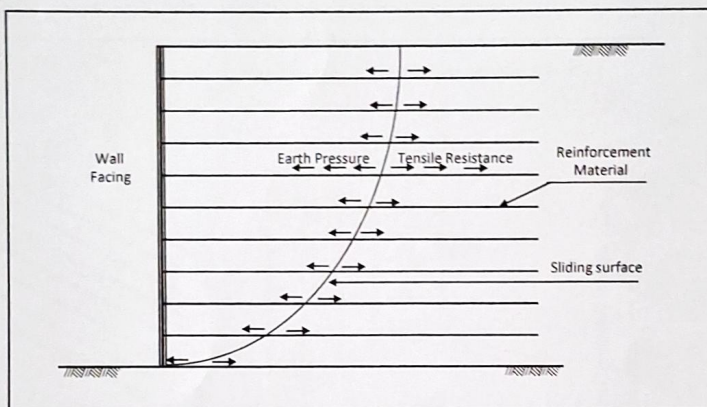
Conceptual Mechanism of Reinforced Earth Walls
